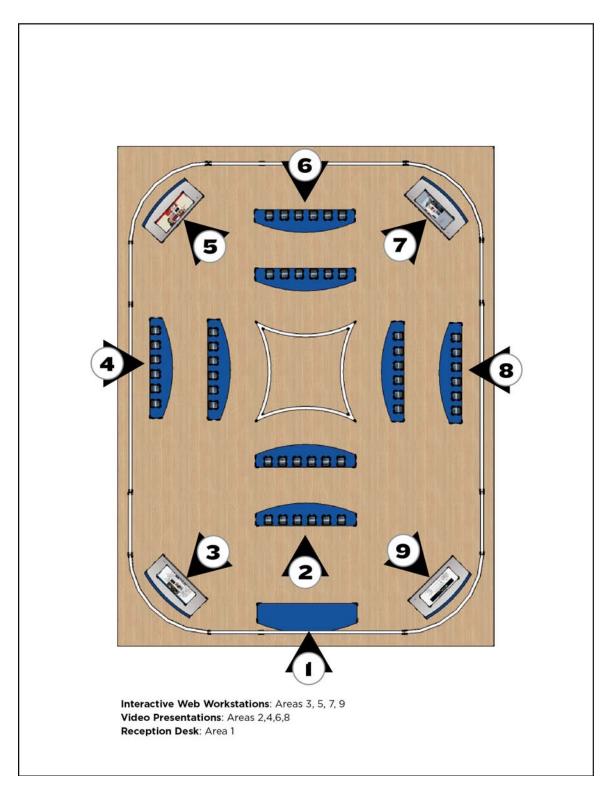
EBE 30' x 40' Floorplan Configuration
